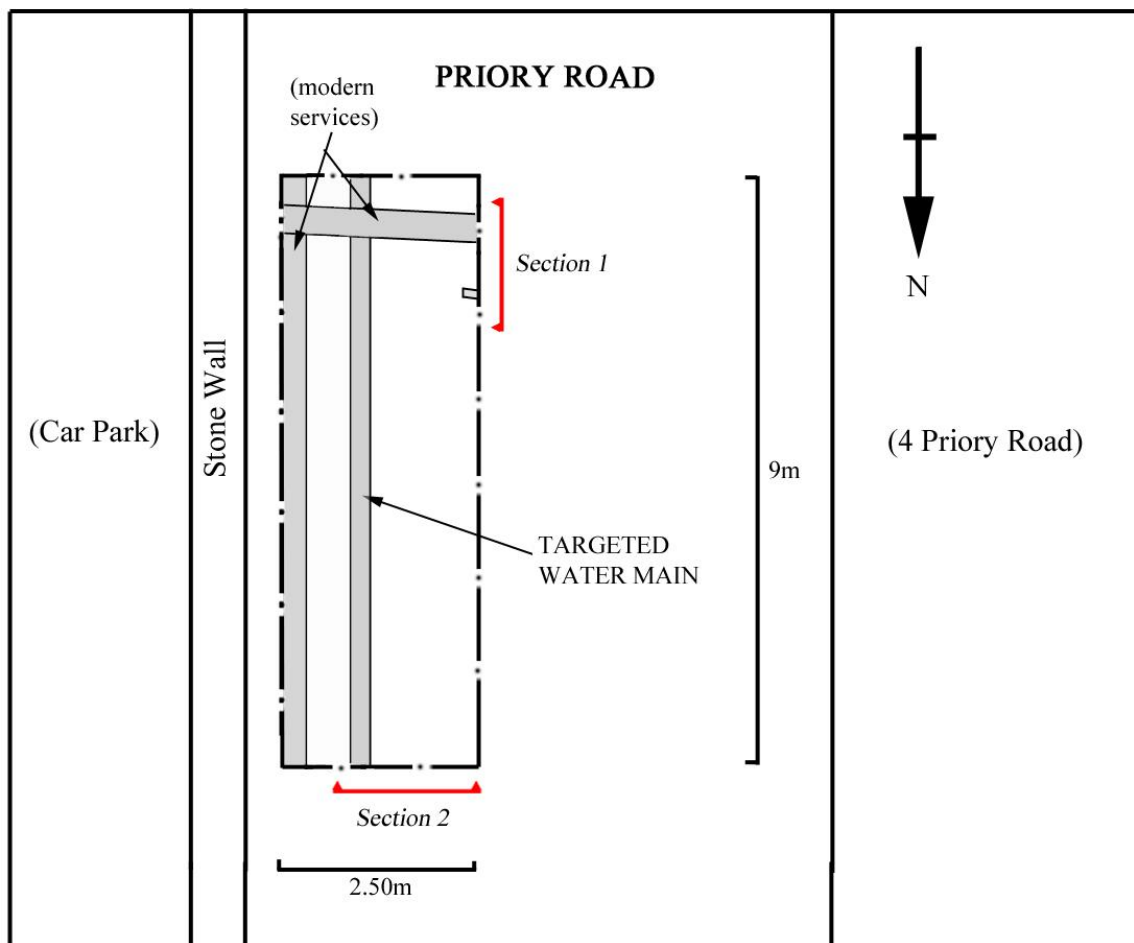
Plan of N-S Trench, highlighting Sections 1 & 2, and modern services (not to scale)
